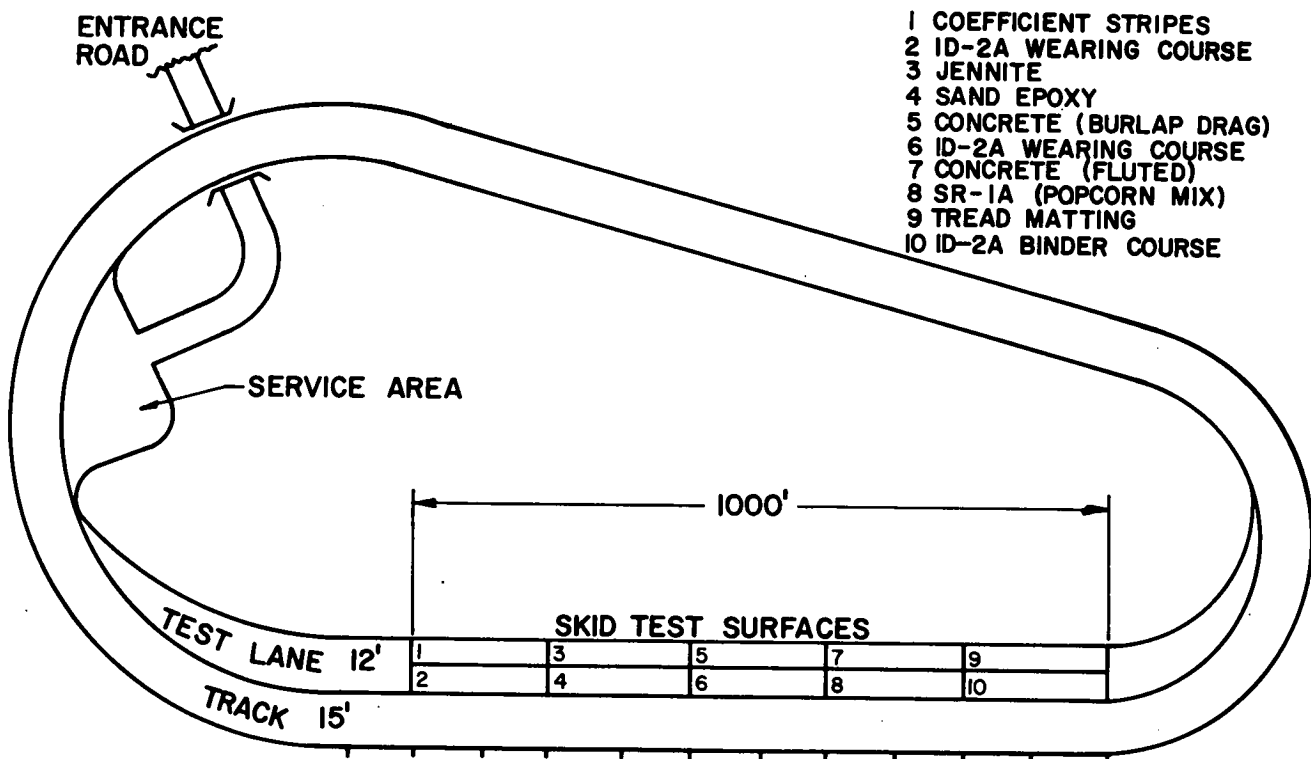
Test surfaces installation at Pavement Durability Facility.
